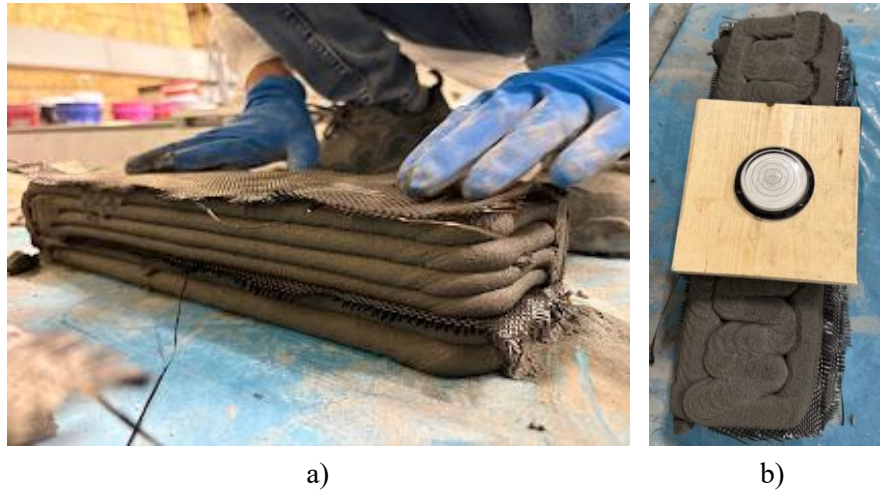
(a) Placement of fabric in 3D Printed specimens, (b) Checking the level for printed specimens
